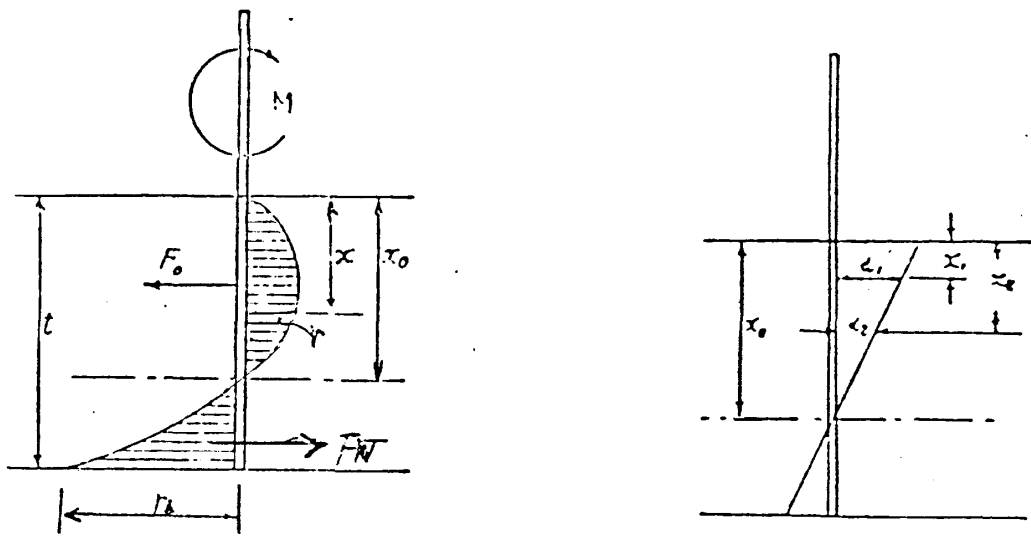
Stability Calculation Model of Caisson Foundation, Kiso and Ibi Railway Bridge
